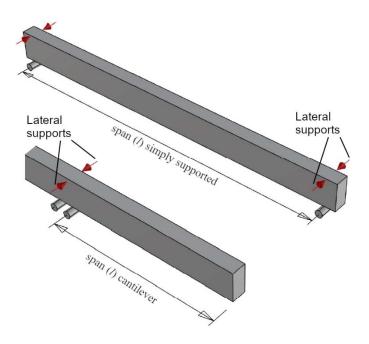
Simply supported beam and cantilever beam are assumed as fully restrained against lateral movement by lateral supports.
